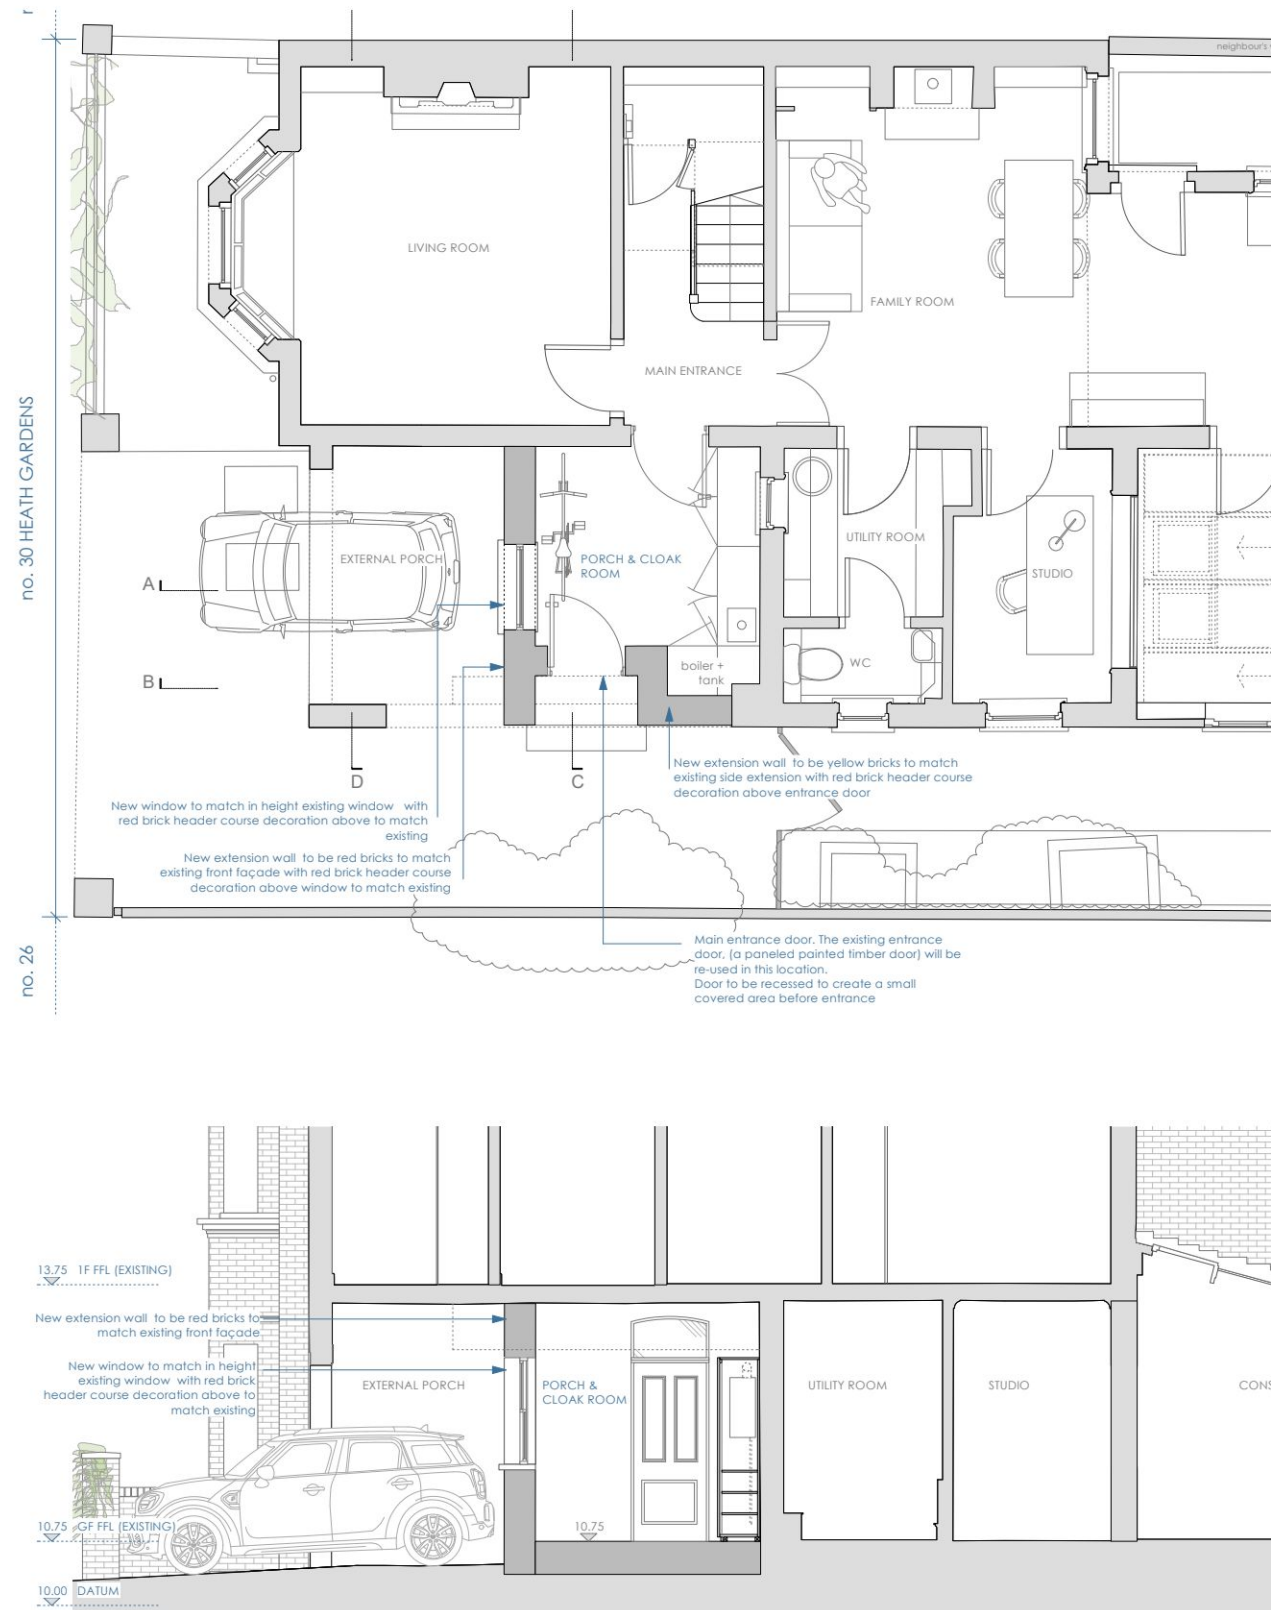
Proposed GF plan and Section ( extract from presented drawings)
